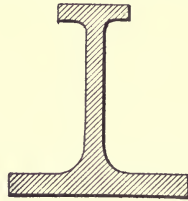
BEST SECTION FOR CAST-IRON BEAMS.
